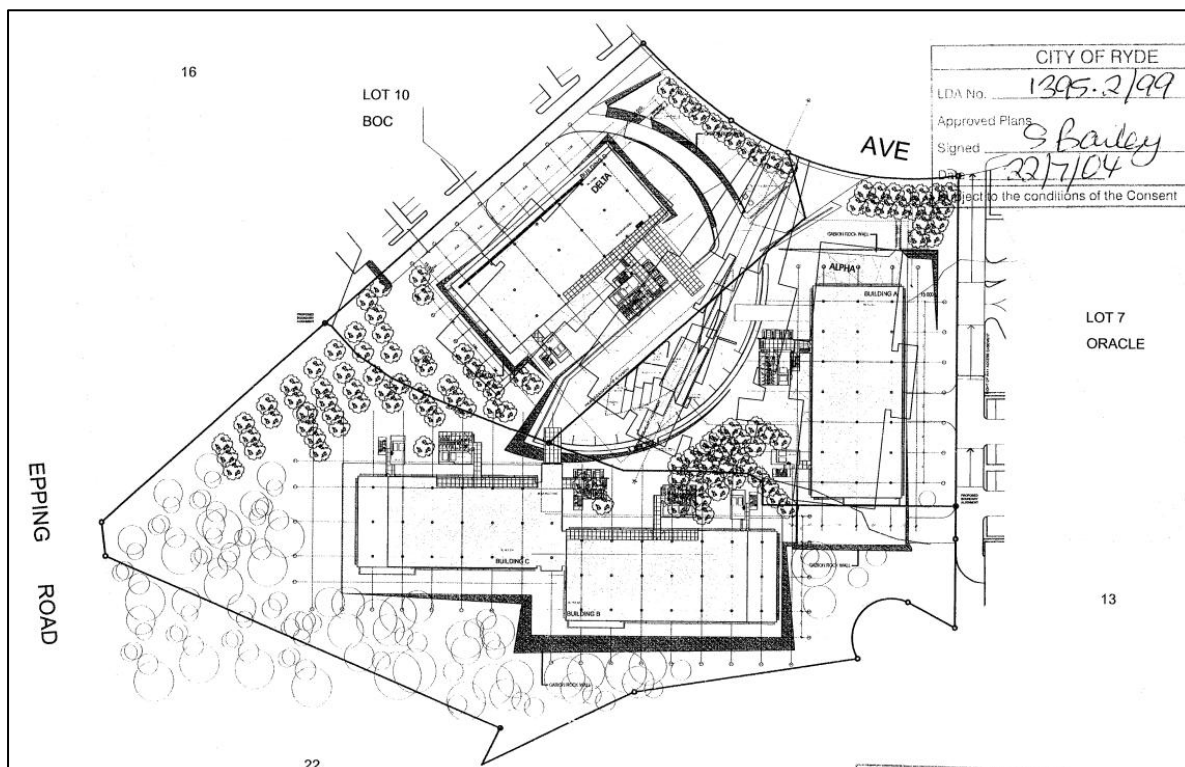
Site Plan - Modified Determination No. 1395.2/99 (Source: Ryde City Council, 2025)
